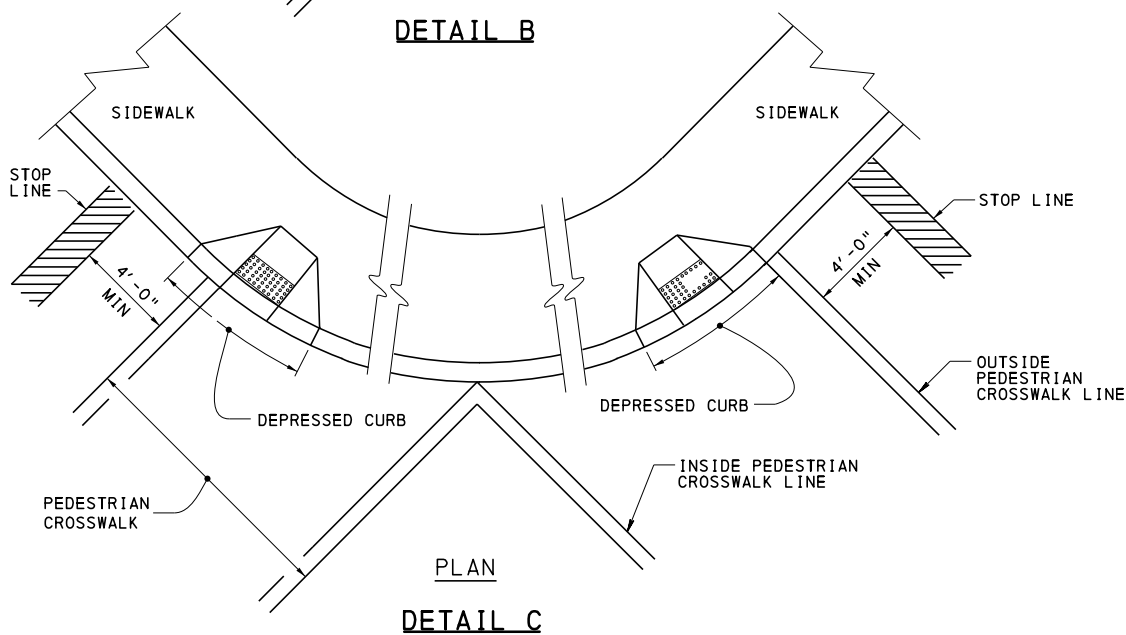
DETAILS ARE FOR CROSSWALK PAVEMENT MARKINGS ONLY
